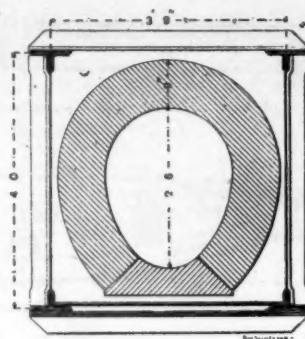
TRANSVERSE SECTION OF STEELWORK CARRYING SEWER UNDER DUMBARTON ROAD
